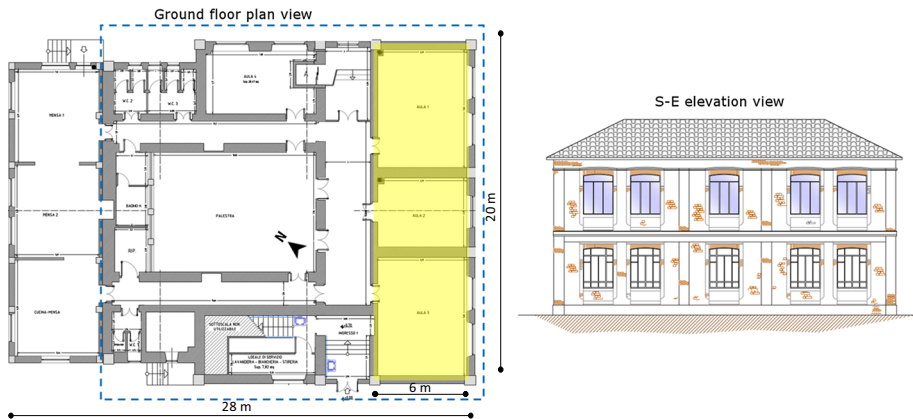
Ground floor plan view and South/East elevation view of URM/RC building school of Force: the URM part in the dashed blue line box and the most damaged portion highlighted in yellow
